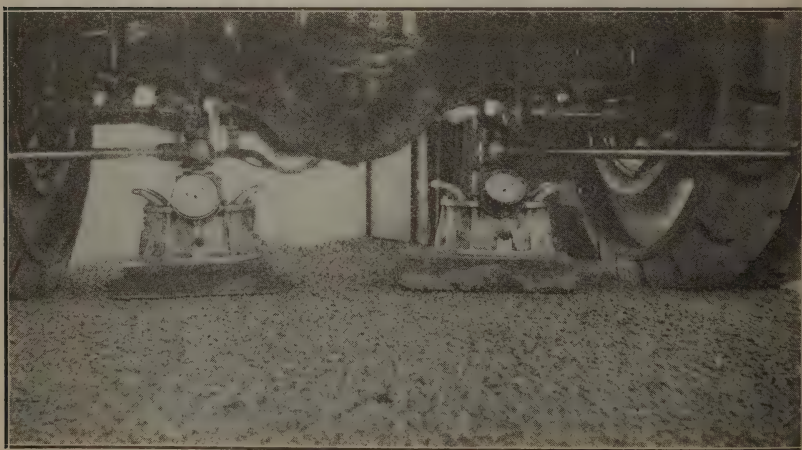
Plate XLV. State Highway, heavily loaded truck, loadometers under rear axle.
